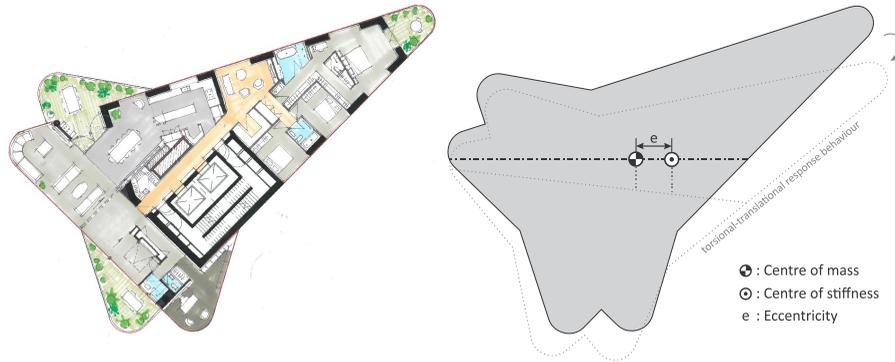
Example of plan irregularity in the 60-storey One Victoria building, Melbourne, Australia (CTBUH, 2021)
